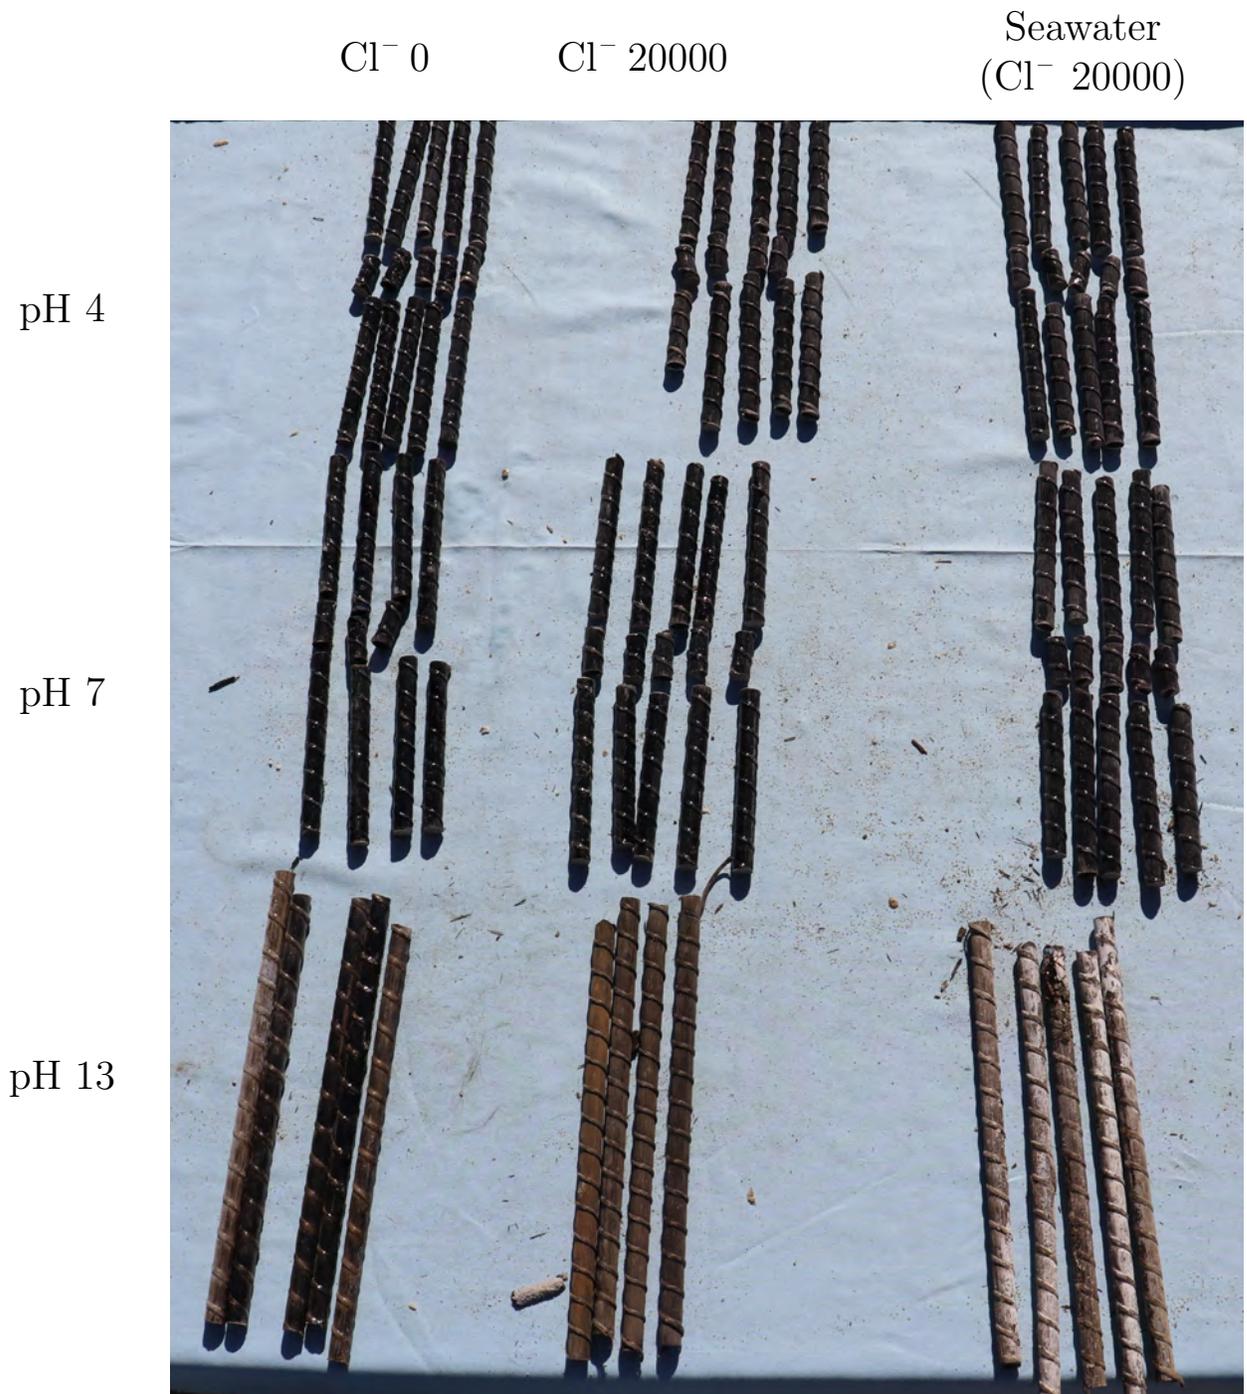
Transverse shear failure mode of Type C # 3 rebars
